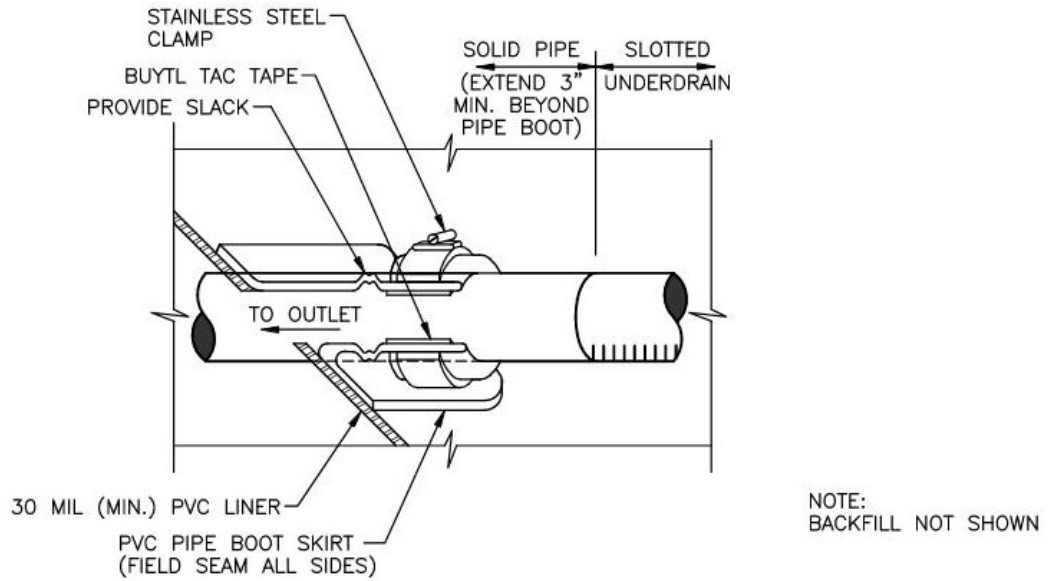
Conceptual Liner Penetration Detail for Underdrain
